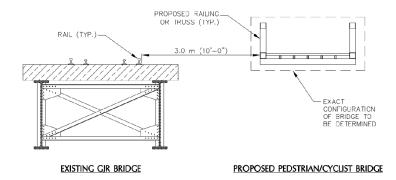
Horizontal spacing requirements for Alternative 1 from existing GJR bridge.
